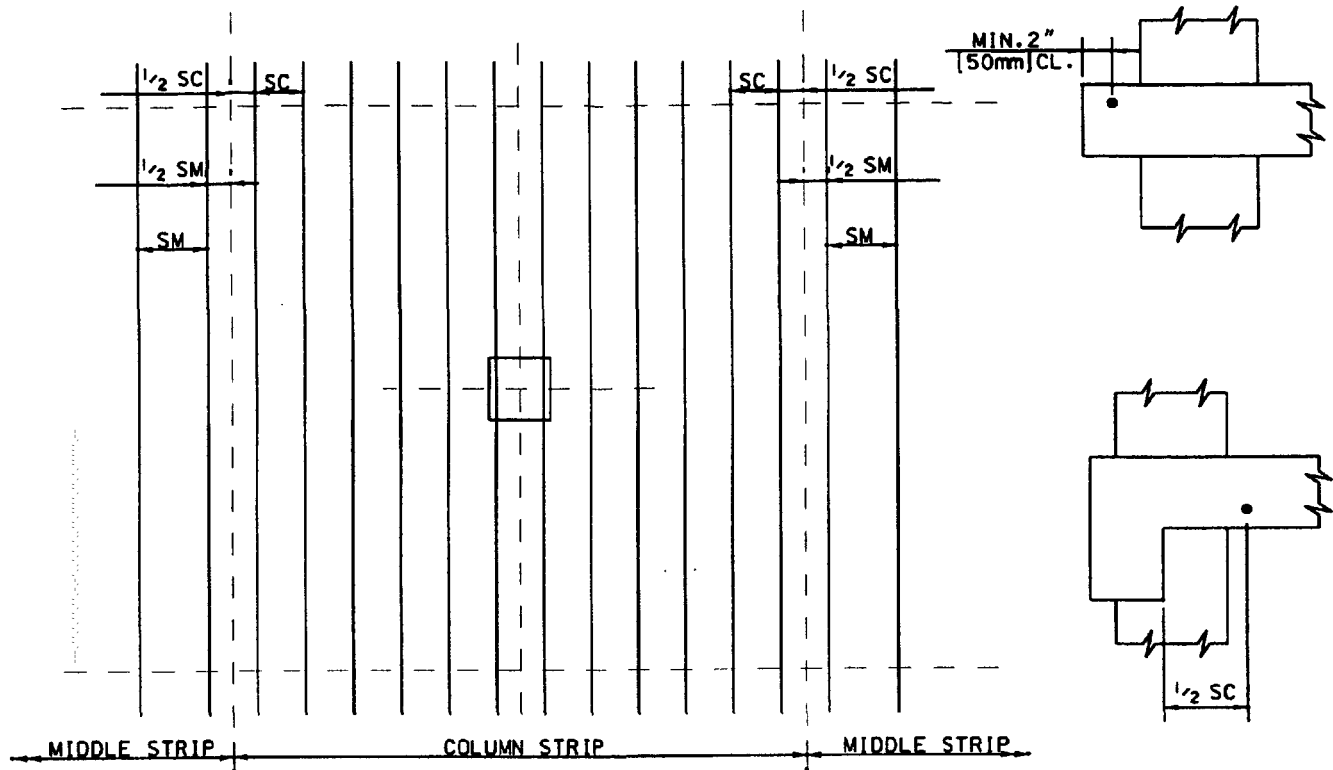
(c)—Location of first bar designated only by size and spacing, reinforcing bars in walls.
